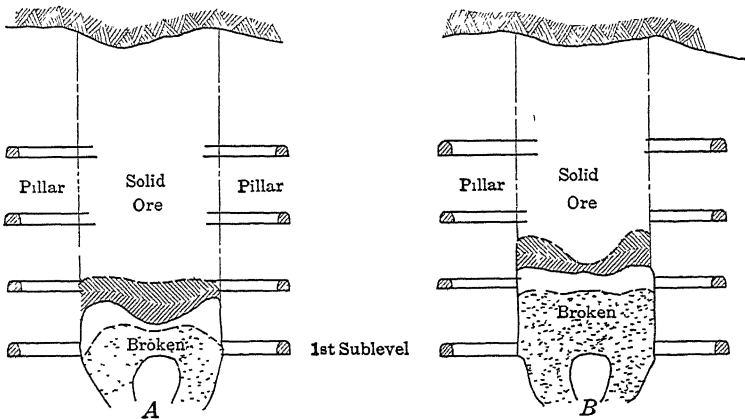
CROSS-SECTIONS THROUGH STOPE, SHOWING POSITIONS OF ROOF.
